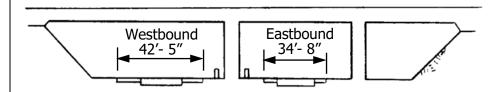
Bridge elevation view of two separate highway features below the bridge.
